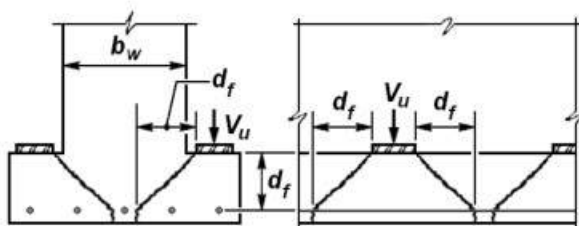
Failure Surfaces for Punching Shear
